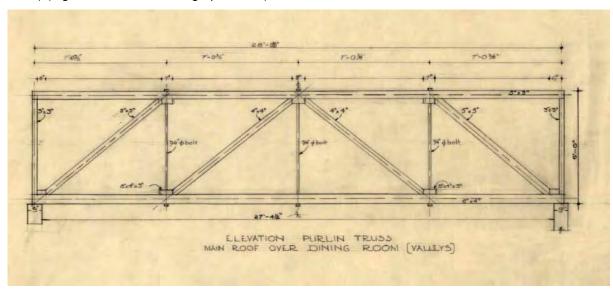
Detail of exposed purlin truss system (originally planned to be the dining hall ceiling, then the lounge in final plans, and later conference room) 1950 (NAA #7689987)
